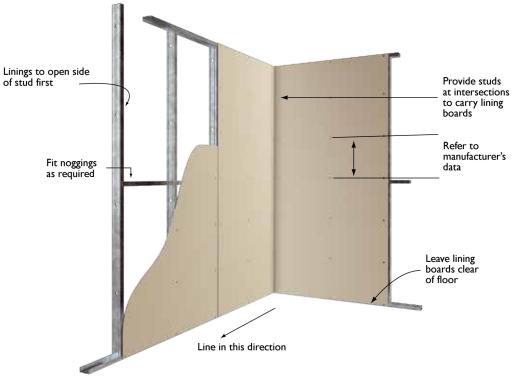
STUD WALL CONFIGURATION AND PLASTERBOARD FIXING DETAIL
